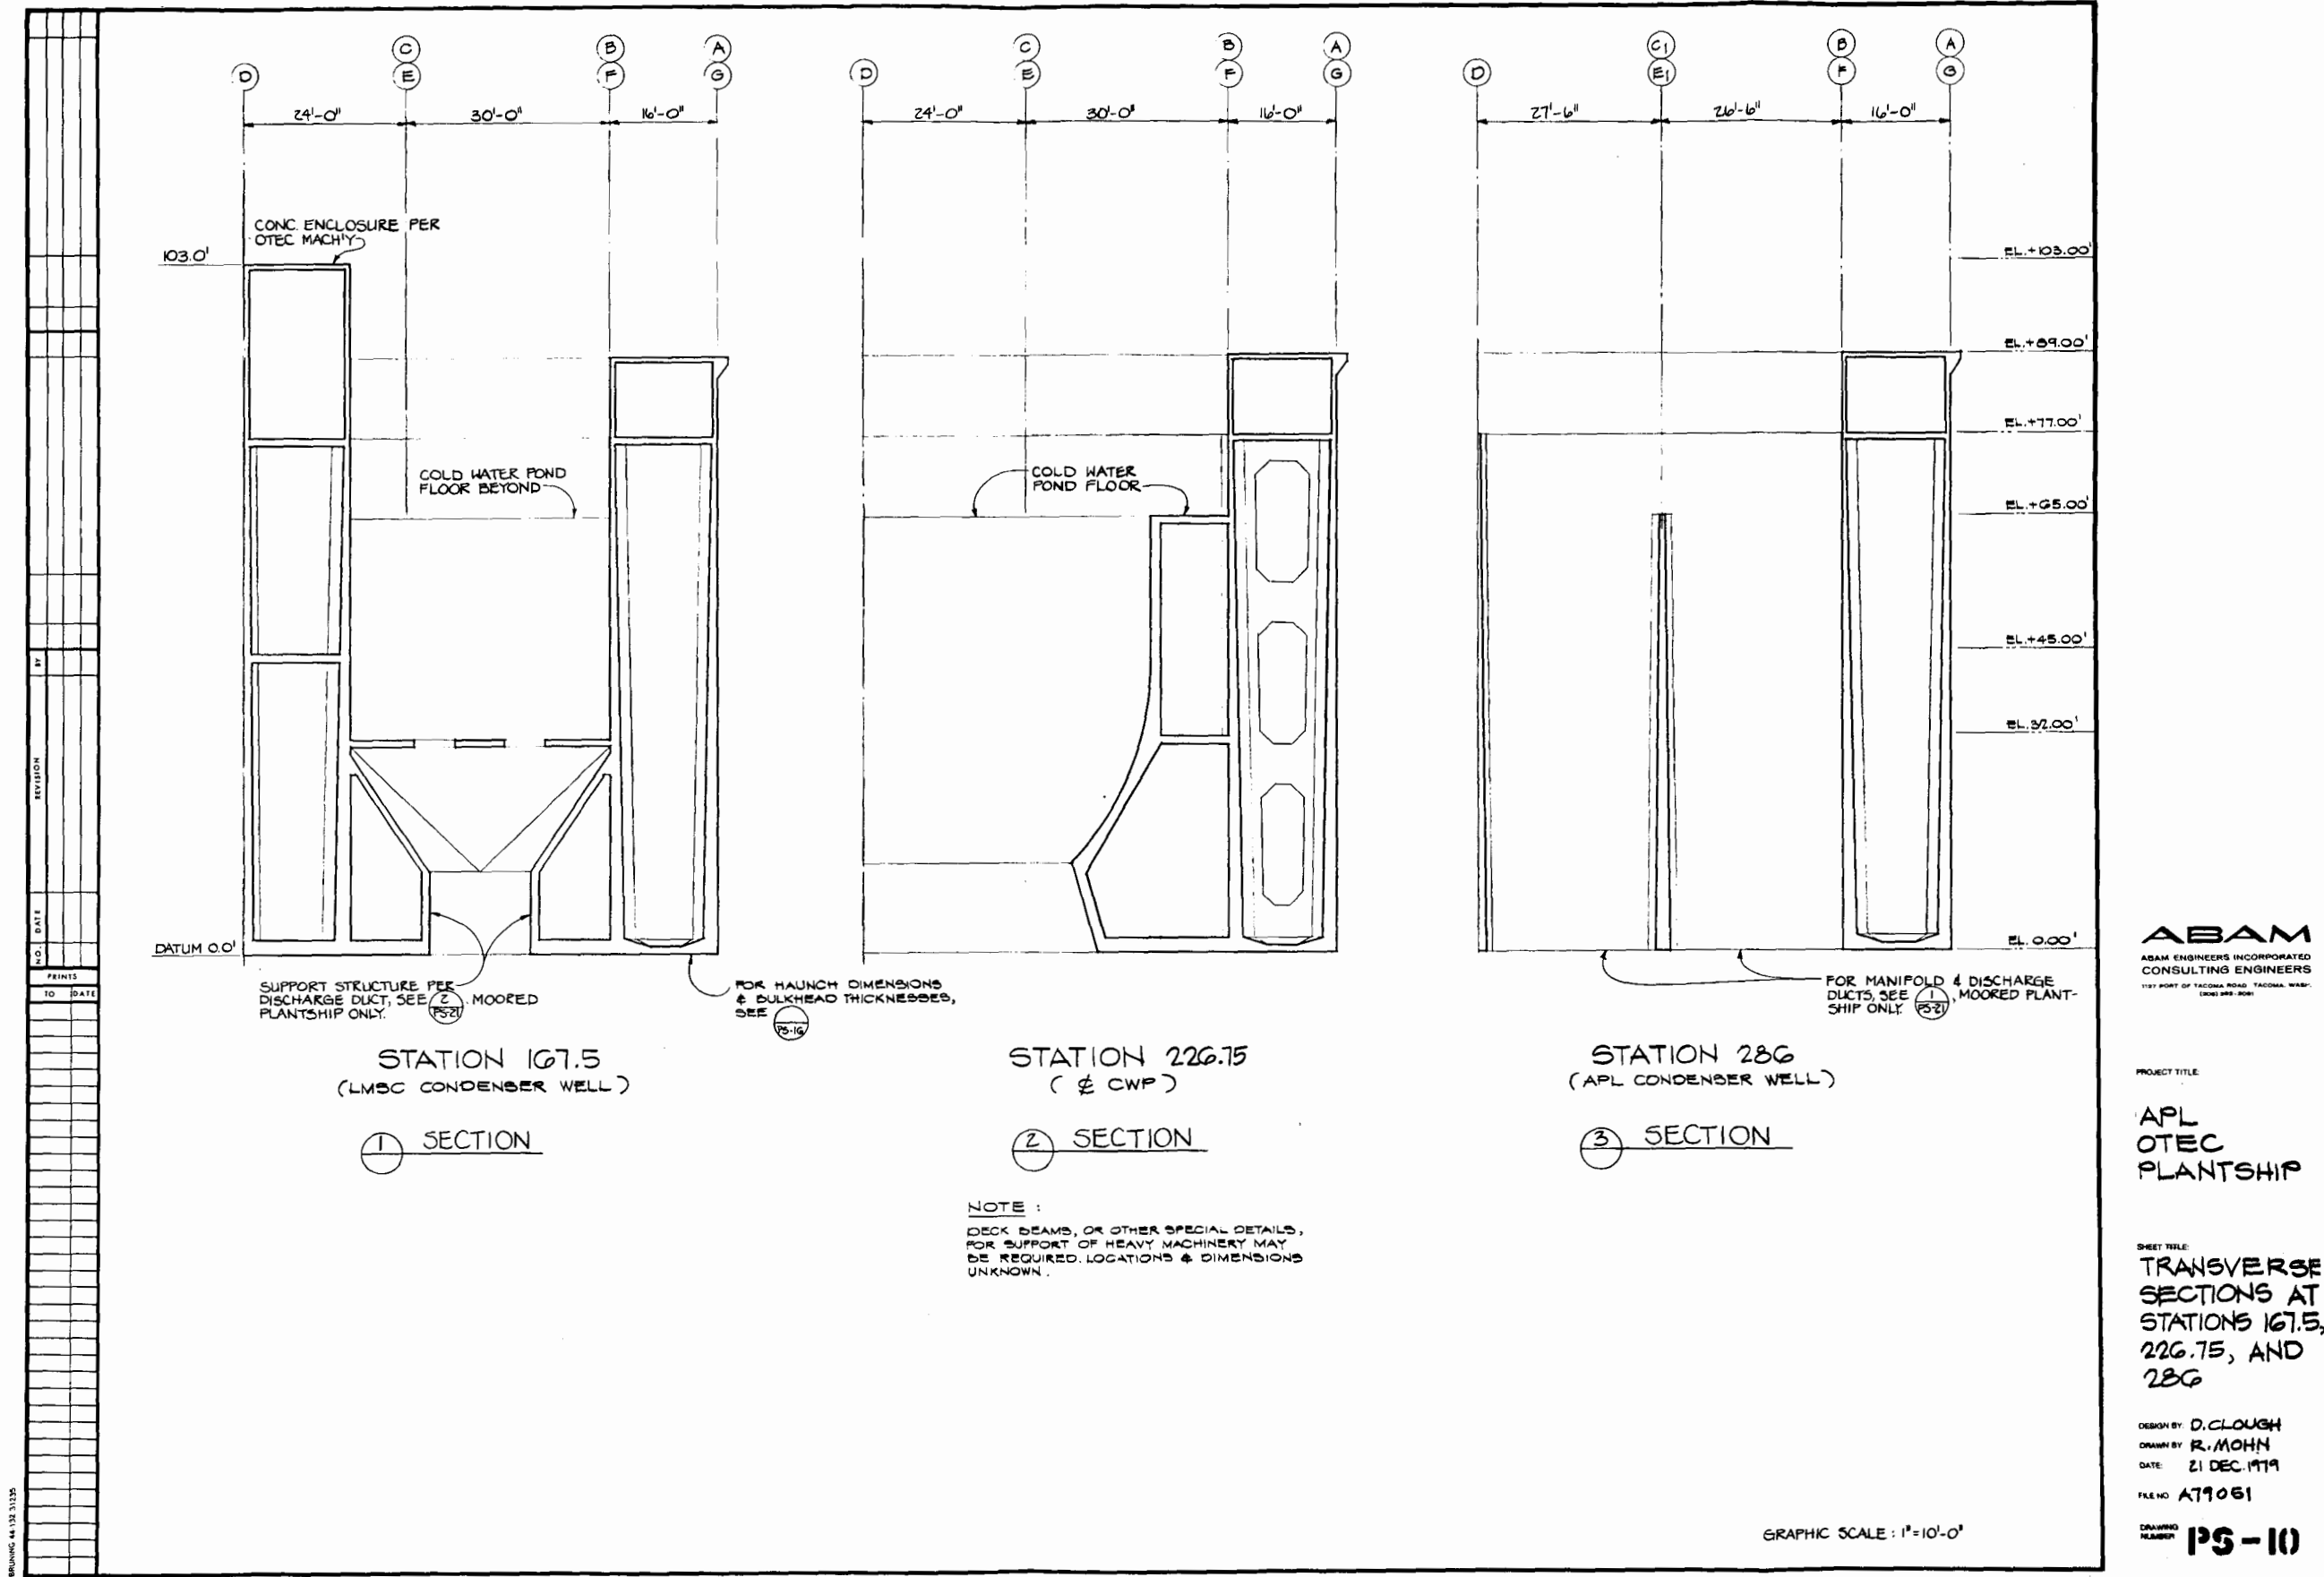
Transverse sections at stations 167.5, 226.75, and 286 (PS-10).
